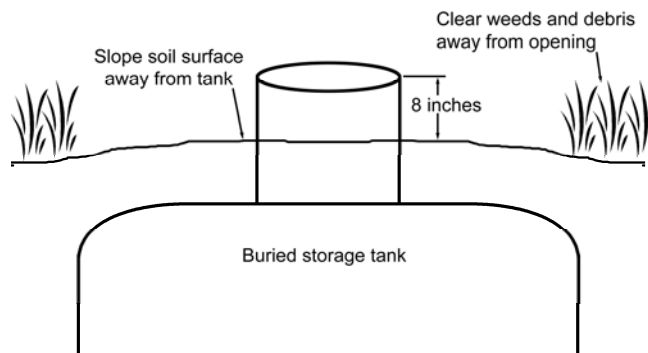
The tank opening should rise at least 8 inches above grade.
